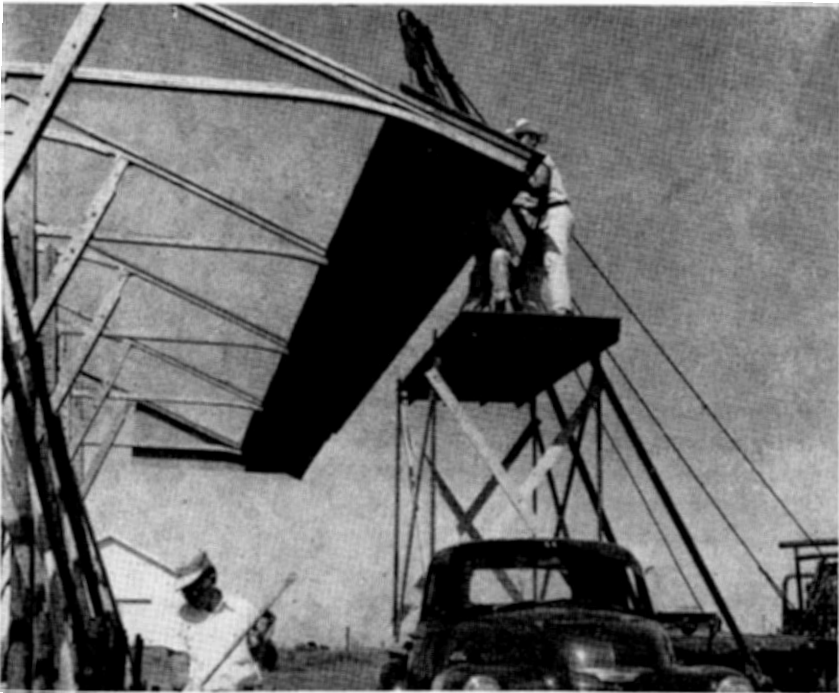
Erection of a 4 ft. by 12 ft. stressed-skin panel for a utility shelter roof. Panel is being lowered into position between main roof frames. Panel is supported by plywood lip at ends.
